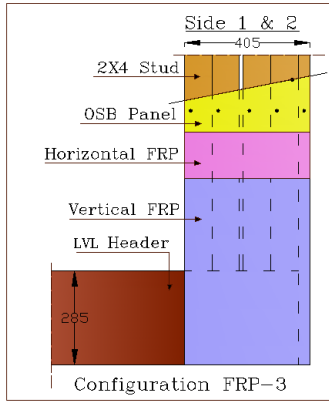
Test configurations of Corner joints (all dimensions are in mm)
